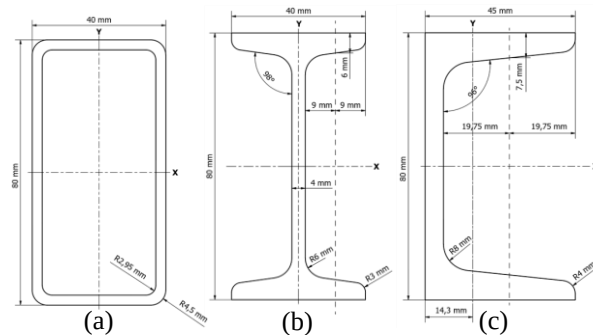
Beam section dimension, (a) rectangular; (b) I-beam (S-section); and (c) C-channel
